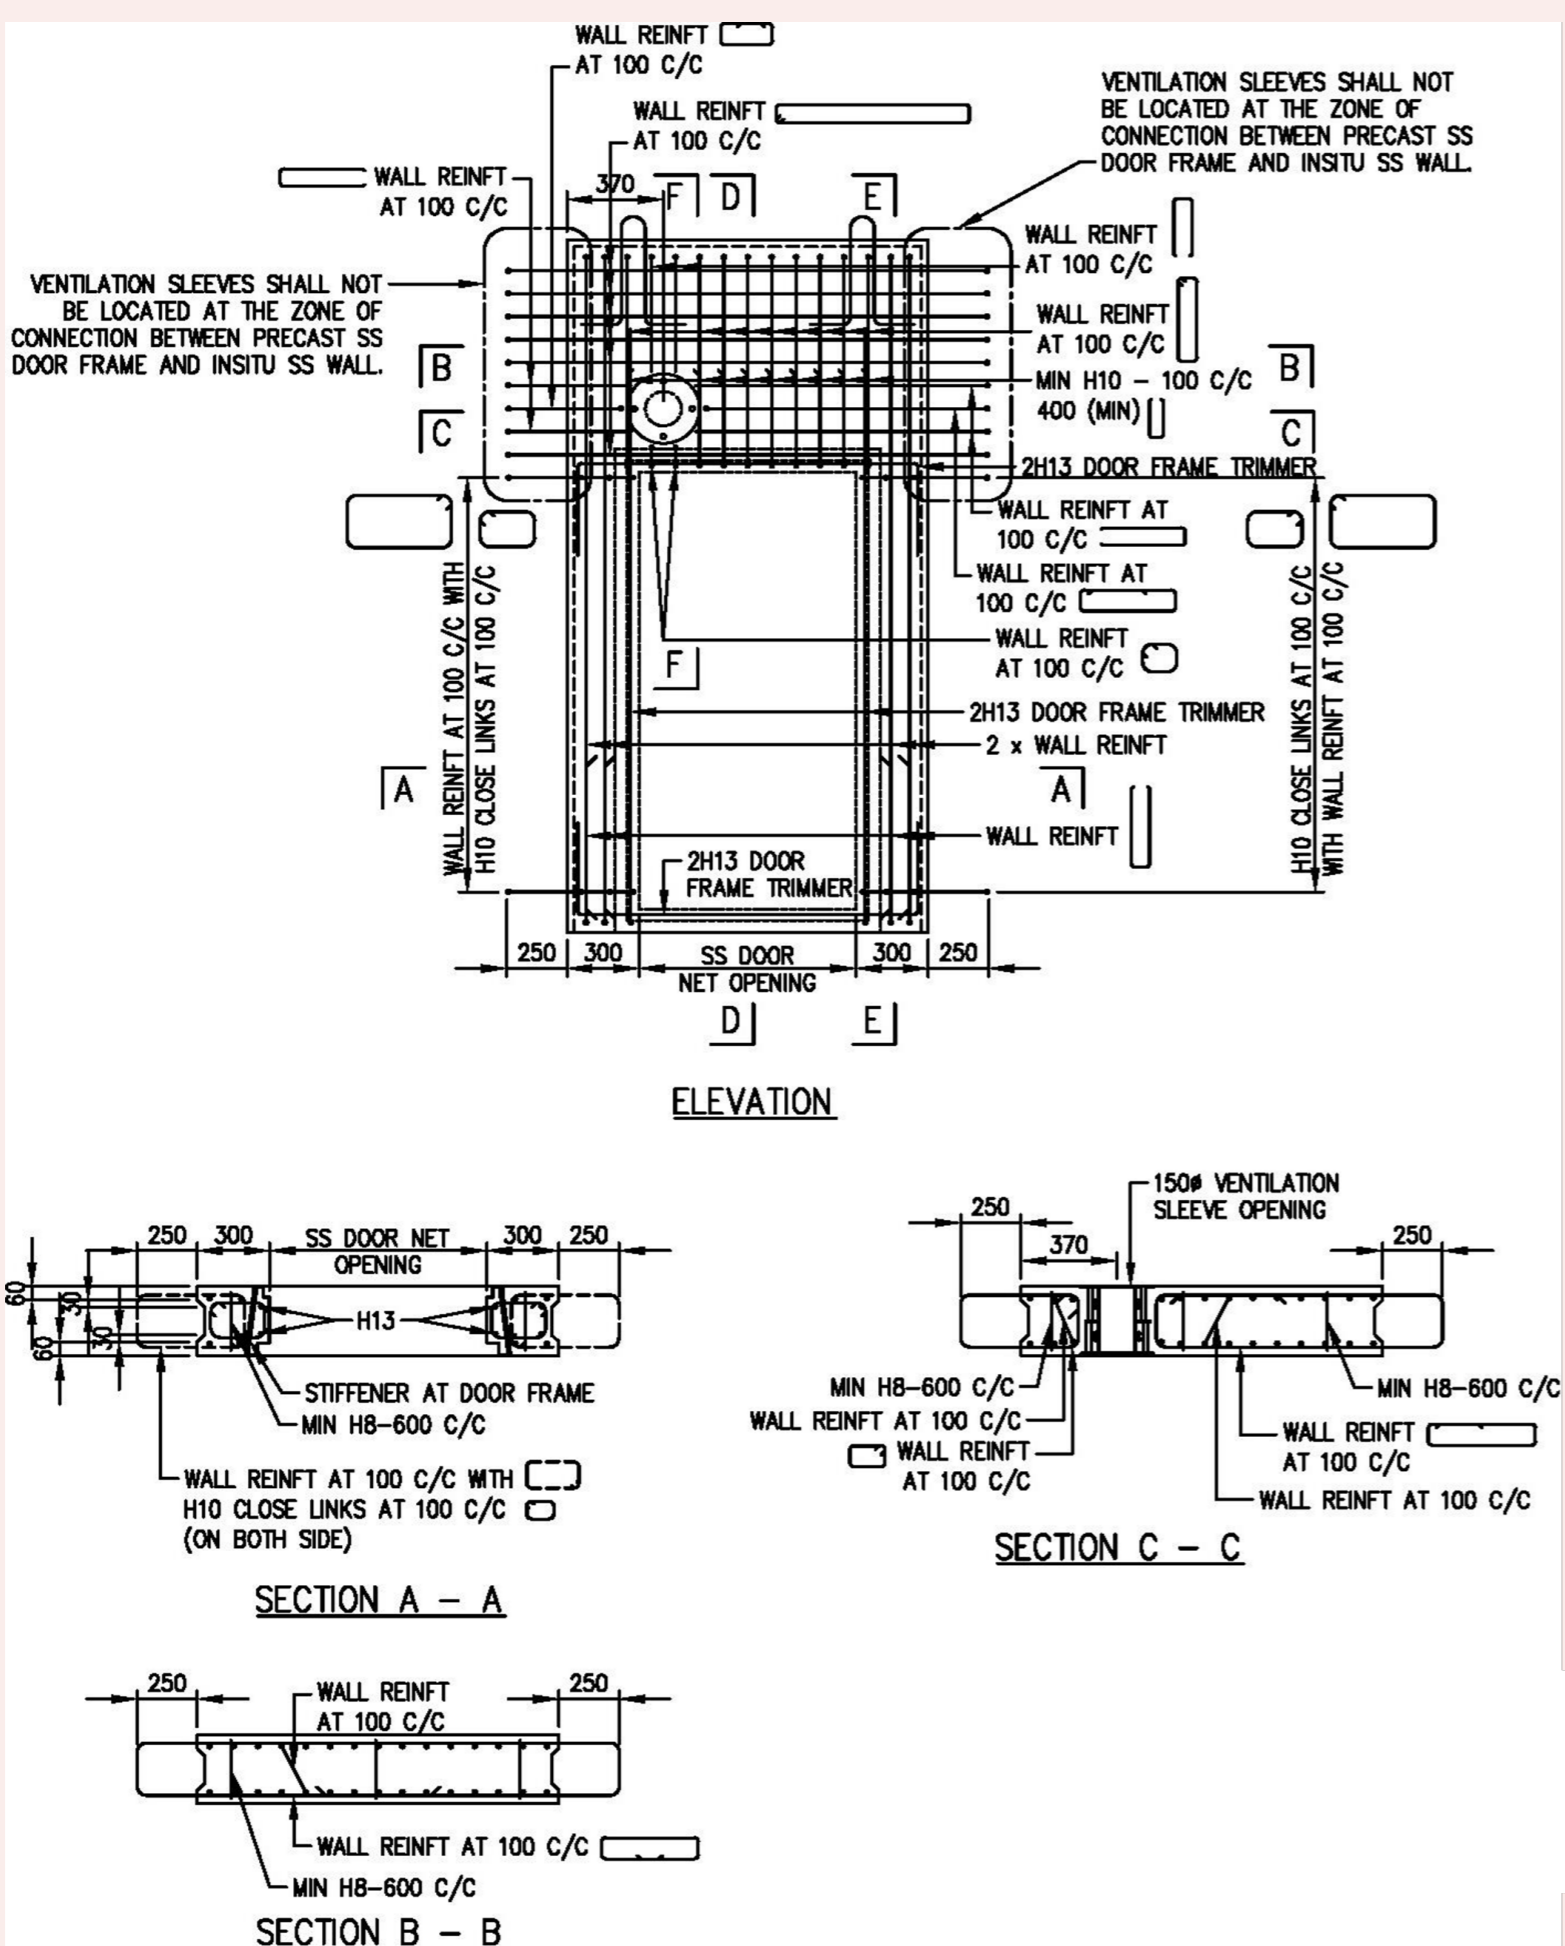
(e): DETAILS AND SECTIONS OF PRECAST SS DOOR FRAME WITH VENTILATION SLEEVE ALONG ITS SIDE (TYPE 1)
